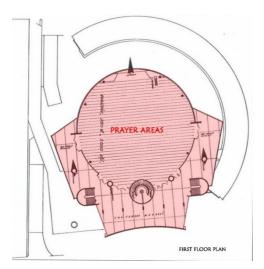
Terzi Baba Mosque 1st floor plan, first design in 1990, D.Tevfik Çiper (URL-1).
